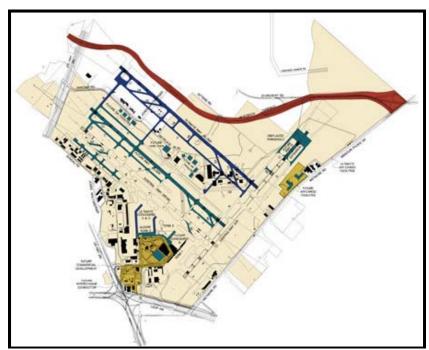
San Antonio International Airport—Wurzbach Road Plans.
